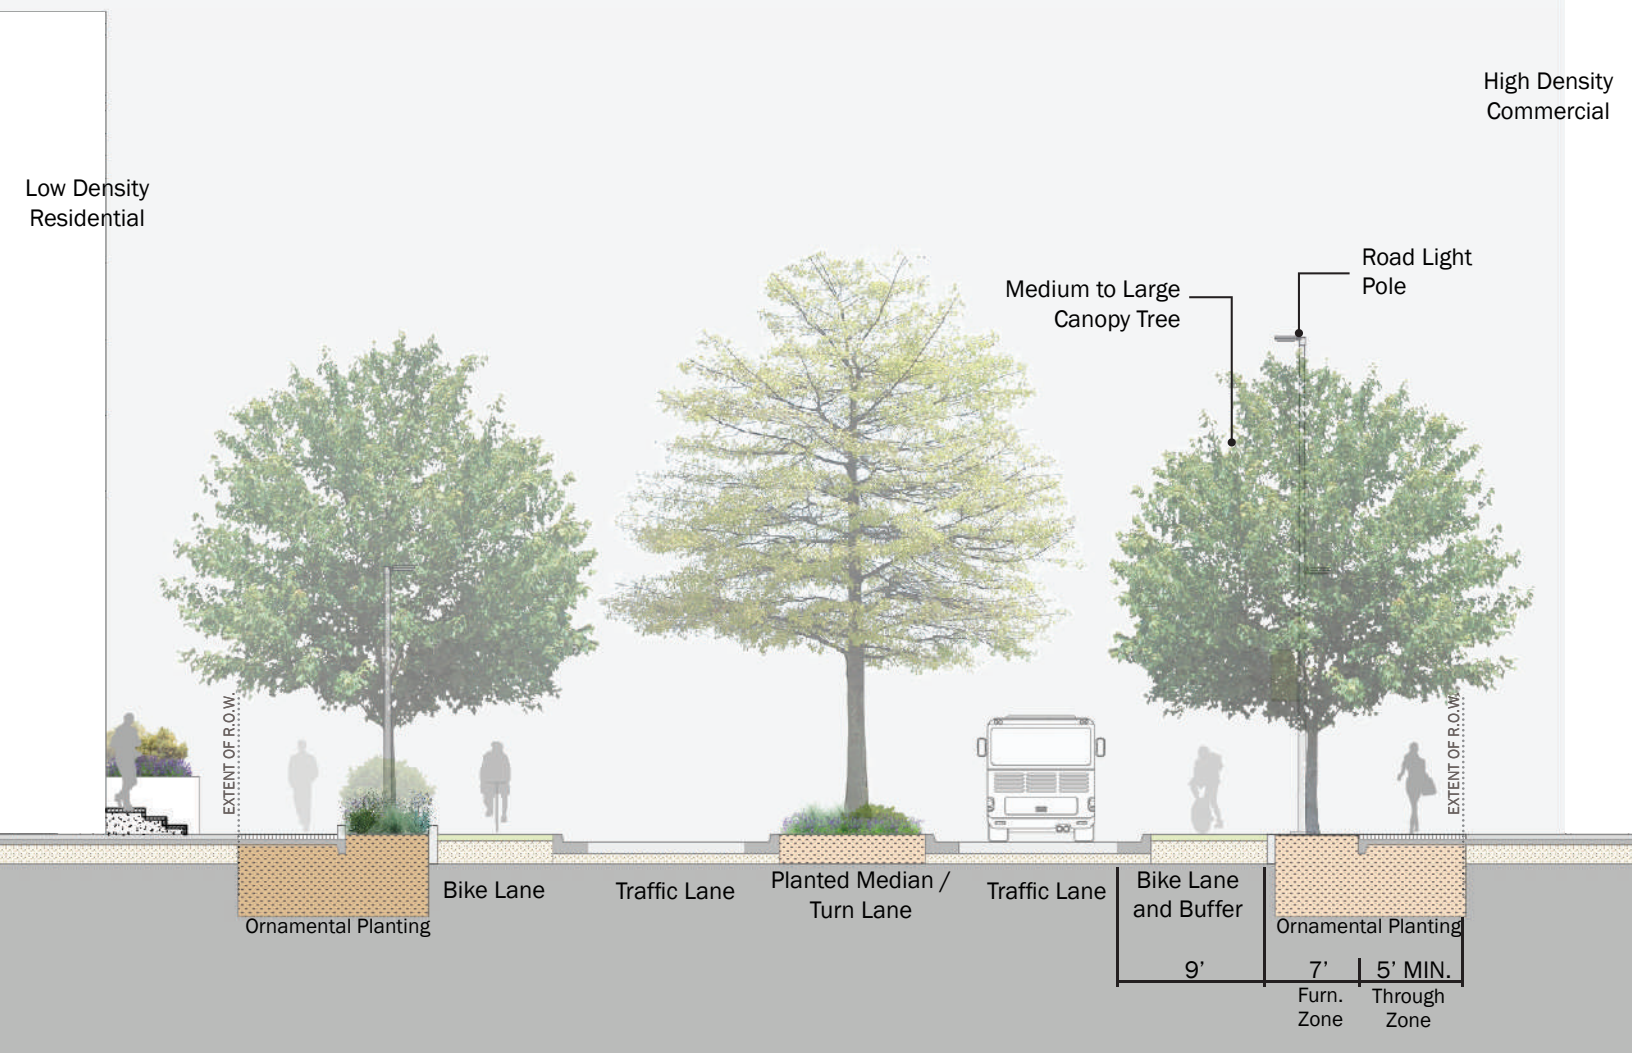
BAYLANDS BOULEVARD PLAN
